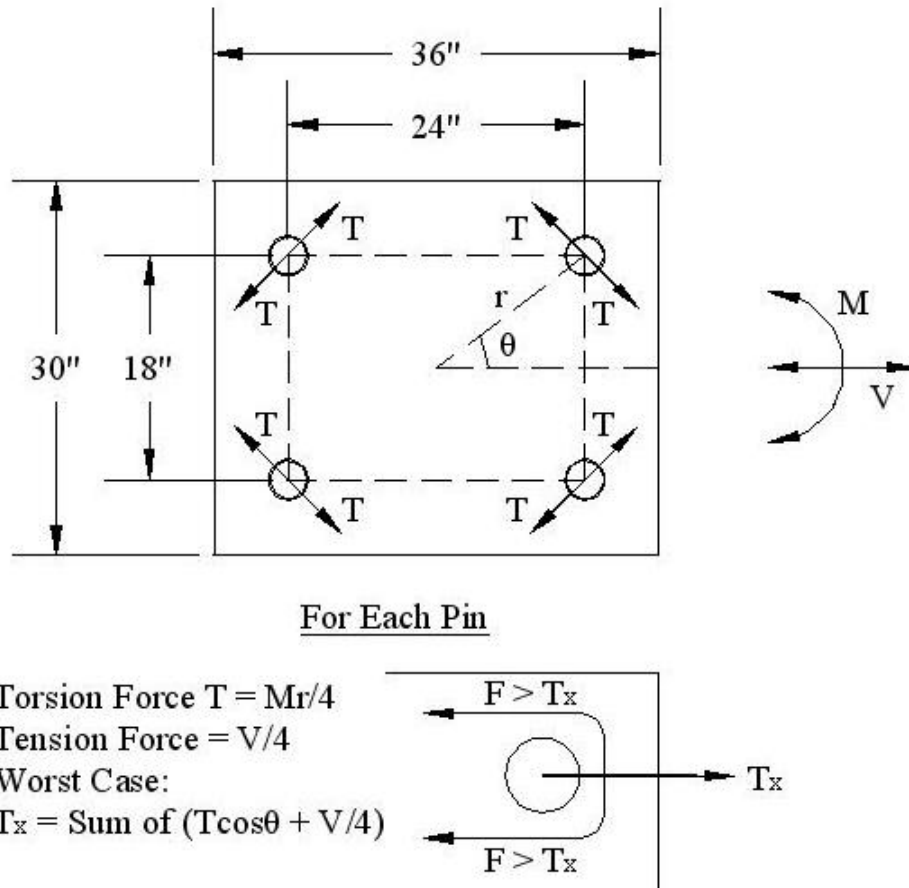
Torsion Design in Top Load Stub (1 in. = 25.4 mm)
